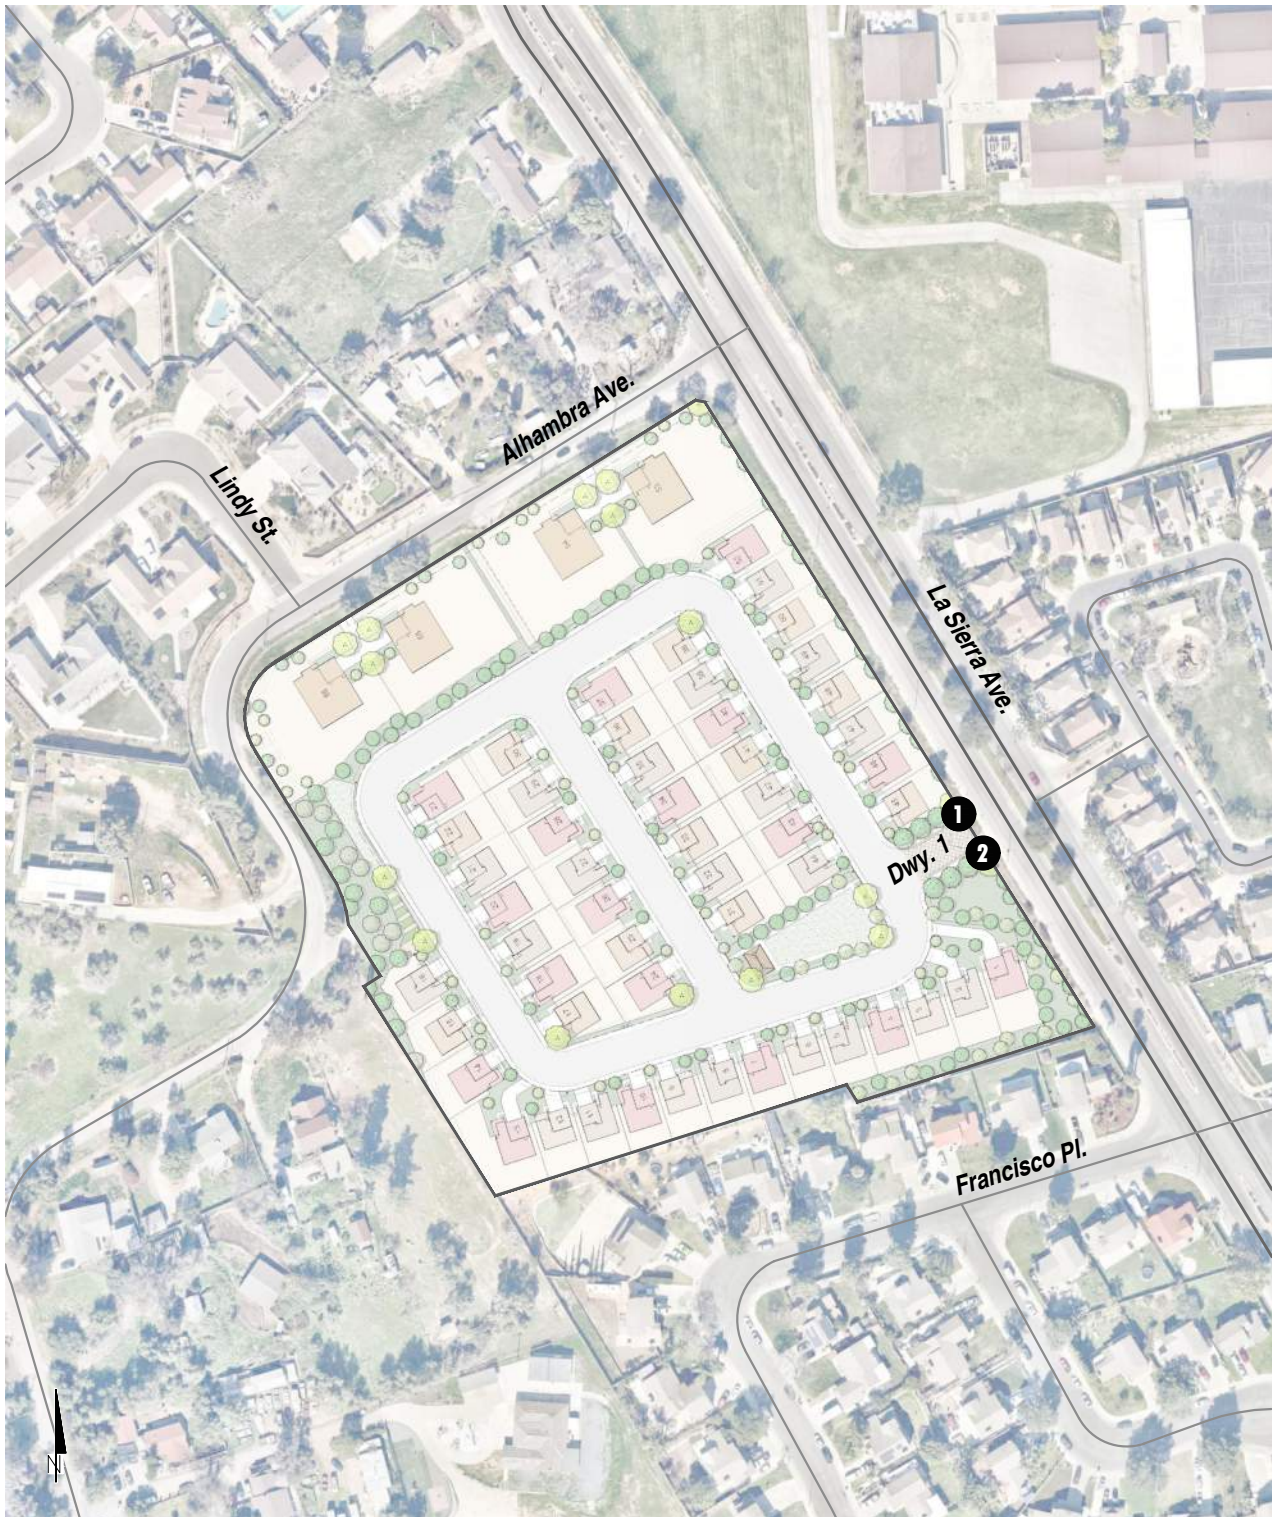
PRELIMINARY SITE PLAN (ALTERNATIVE 1)
